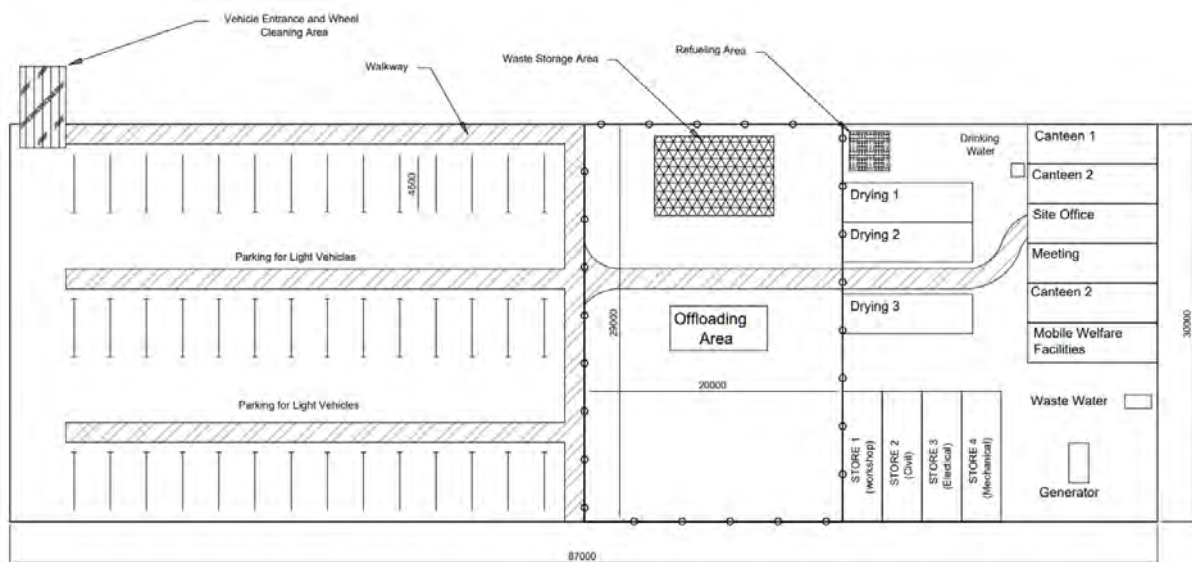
Indicative Typical Site Compound Layout (refer to drawing DRMDY-SD-DR-07)
